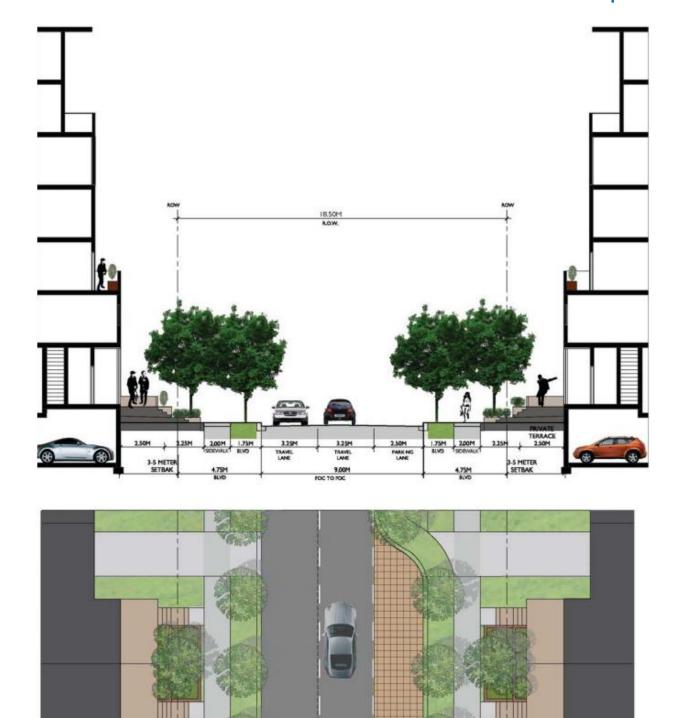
Lake Shore Boulevard – Commercial Building Planned Streetscape
